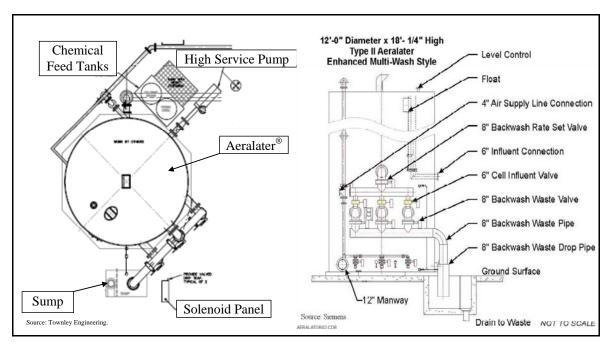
Layout and Schematic of Siemens' AERALATER® Unit
